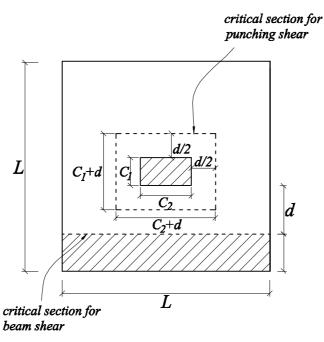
a: Critical sections for punching and beam shears (square footings)
